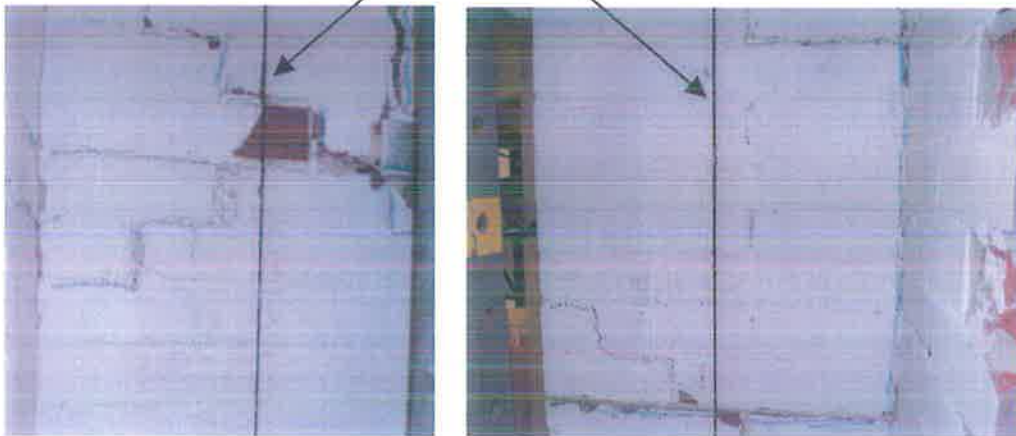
Grooves cut in masonry wall (Wall 4)
